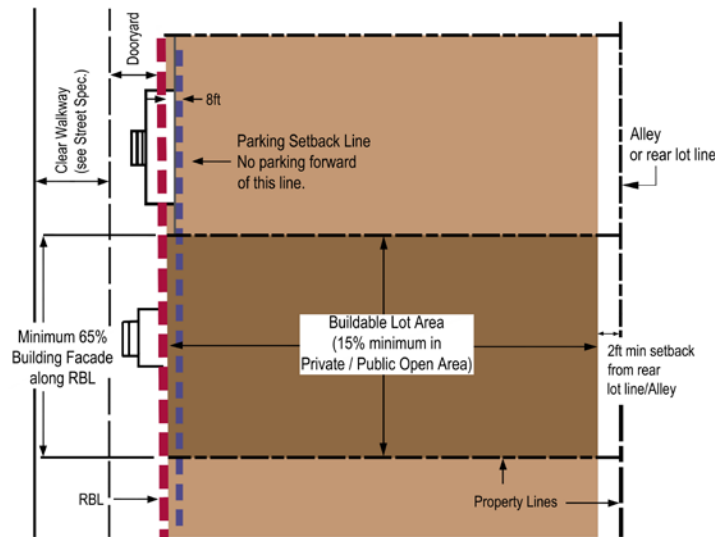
Townhouse/Small Apartment Siting Standards
